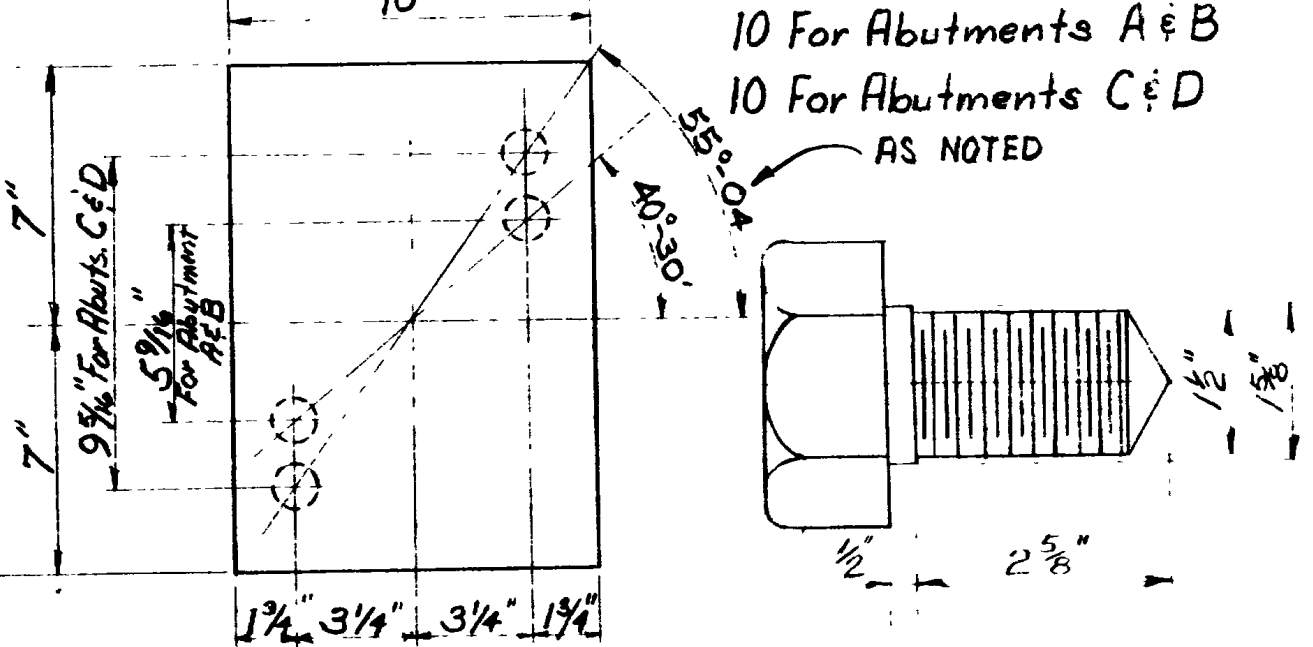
DETAIL OF SLAB EXPANSION UNIT AT ABUTMENTS MAKE 4 As noted above
